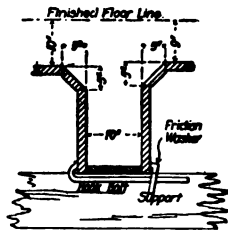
Girder Form Used in Ingalls Building, Cincinnati, O.
